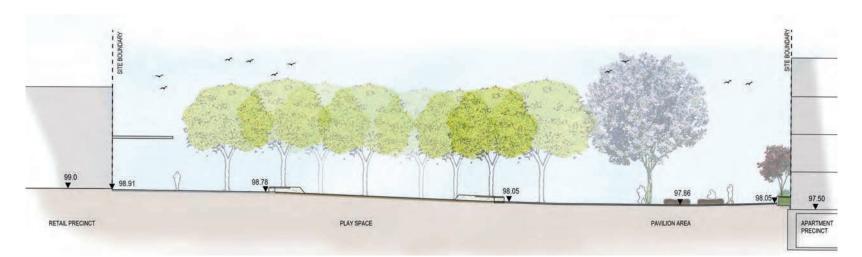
URBAN PLAZA SOUTH CROSS SECTION CC (ILLUSTRATIVE ONLY - SUBJECT TO DESIGN DEVELOPMENT)
